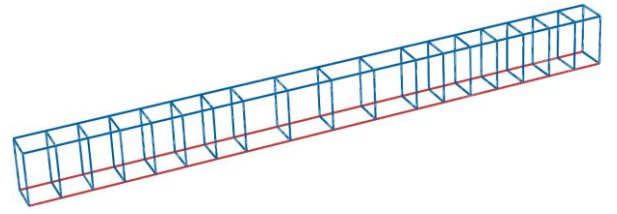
Details of longitudinal and stirrup elements in Abaqus
